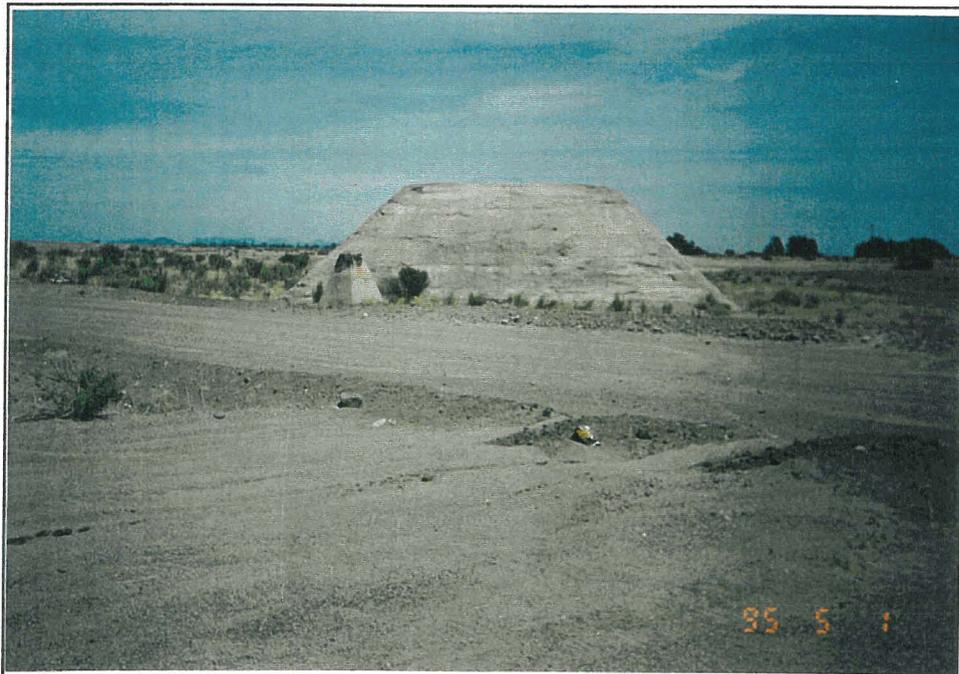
View looking northeast at large deflector dike located upstream of east abutment spur dike. Trapezoidal dike evidently directs flow away from east approach embankment inward toward bridge waterway.
